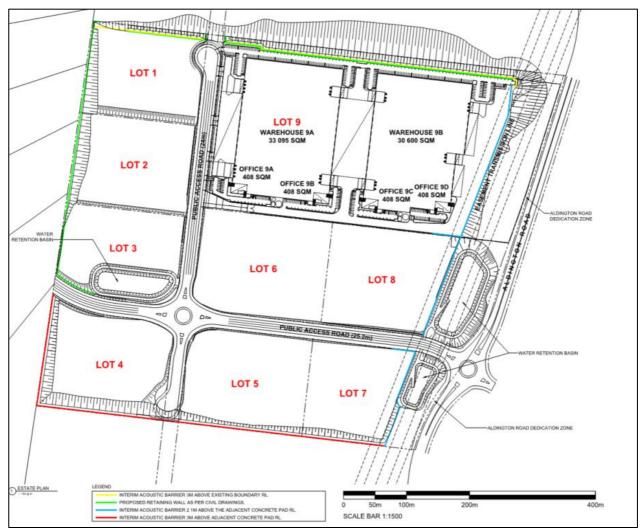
Proposed Master Plan (Source: Frasers 2021)
